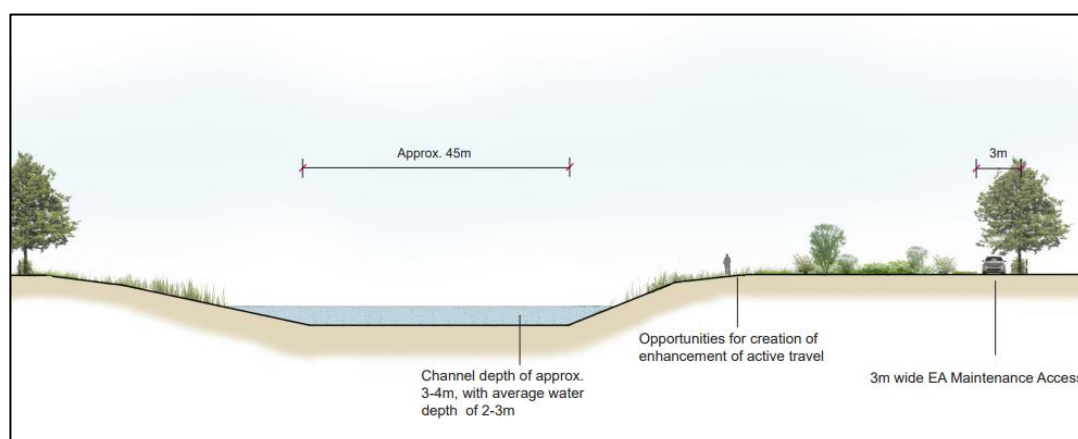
Cross-section example of a typical section of the 'natural' looking trapezoidal channel showing softer slopes with river edge habitat.
